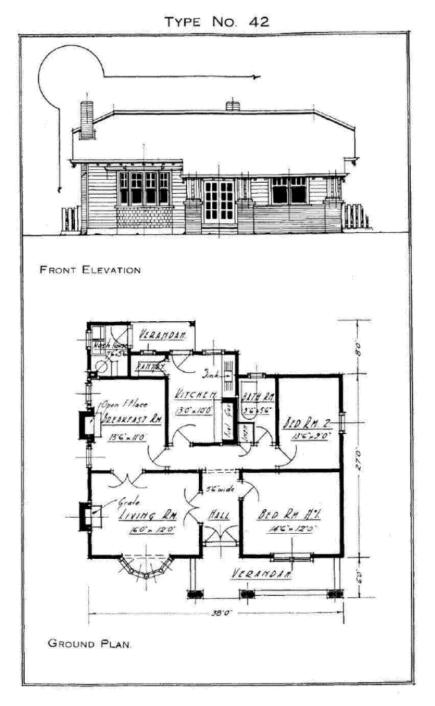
Showing the 1927 State Savings Bank Type No 42 standard plan, the design of the subject building, which was built in the period 1929-34. (Source: State Savings Bank of Victoria 1927:45)
